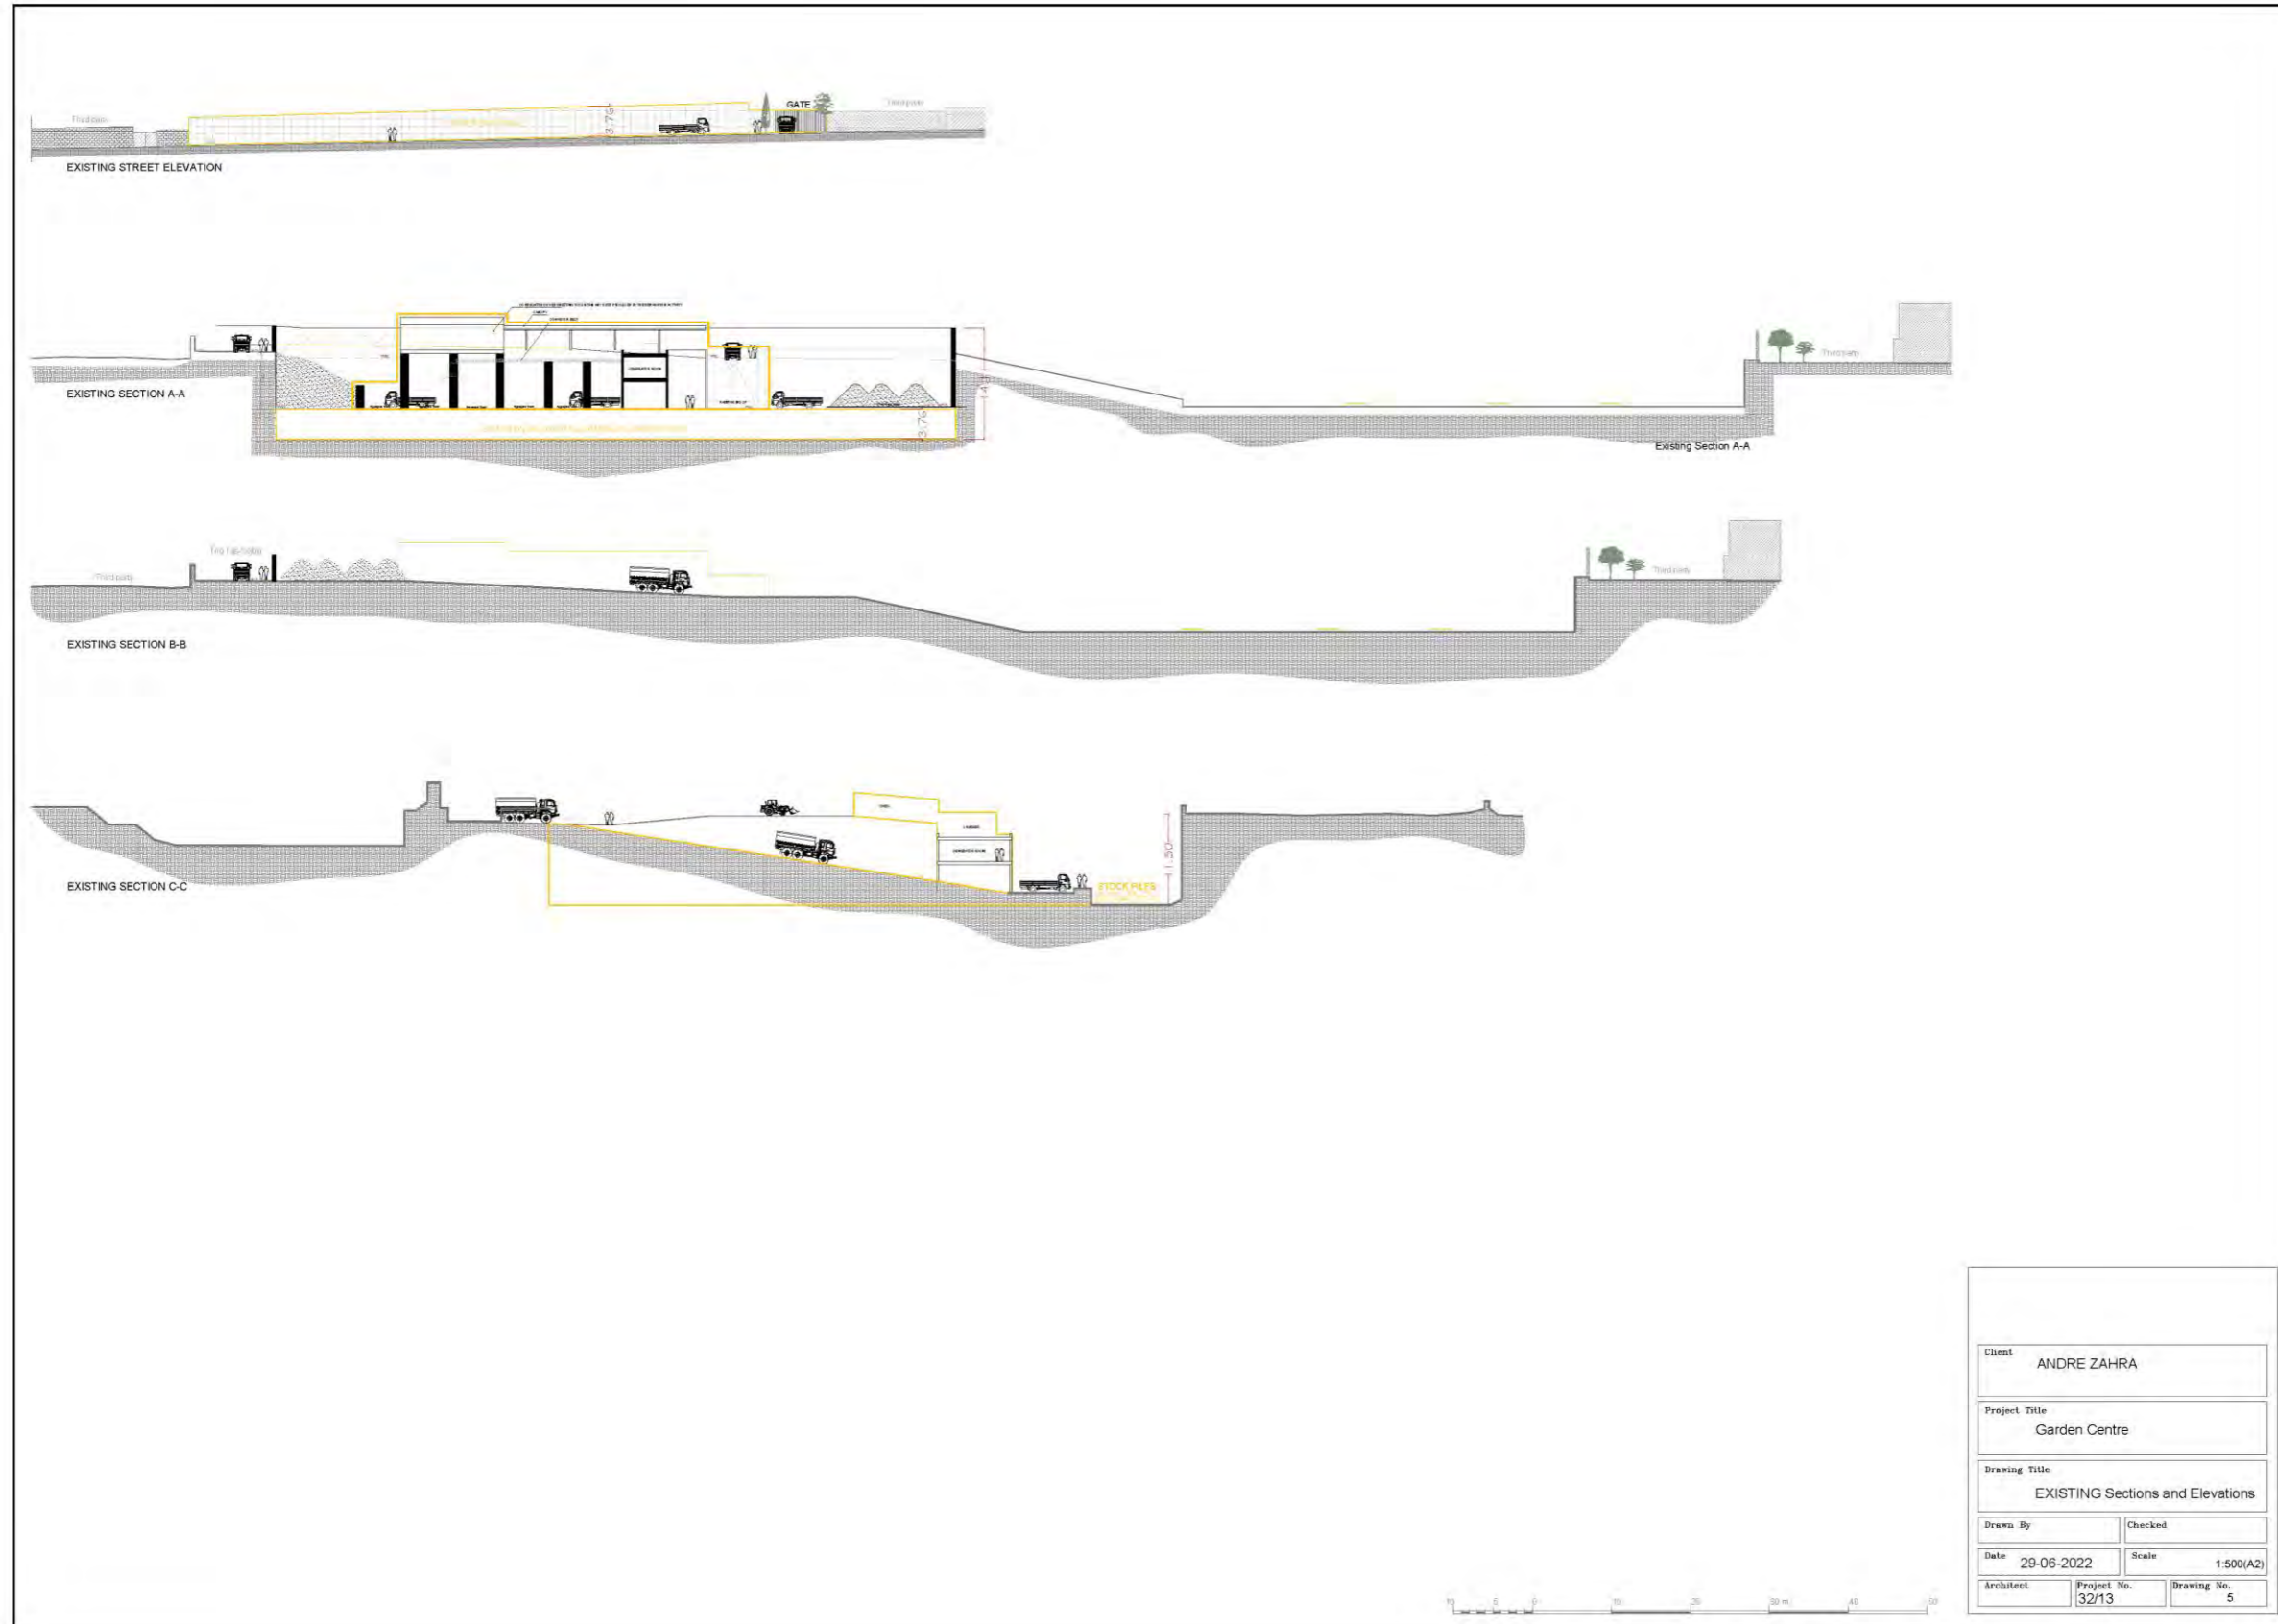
EXISTING ELEVATION AND SECTIONS
